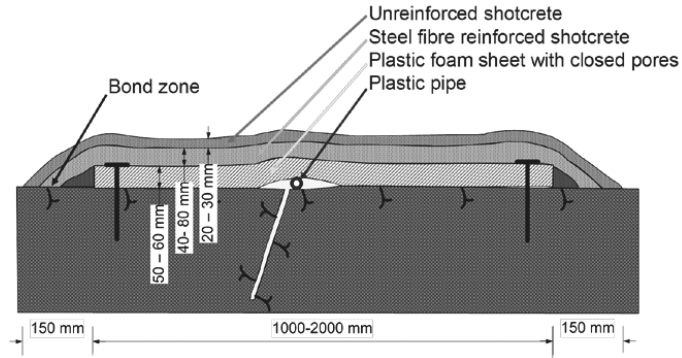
Shotcreted drain on rock – one strip of drain mat covering cracks in the rock. From Holmgren and Ansell (2008b).
